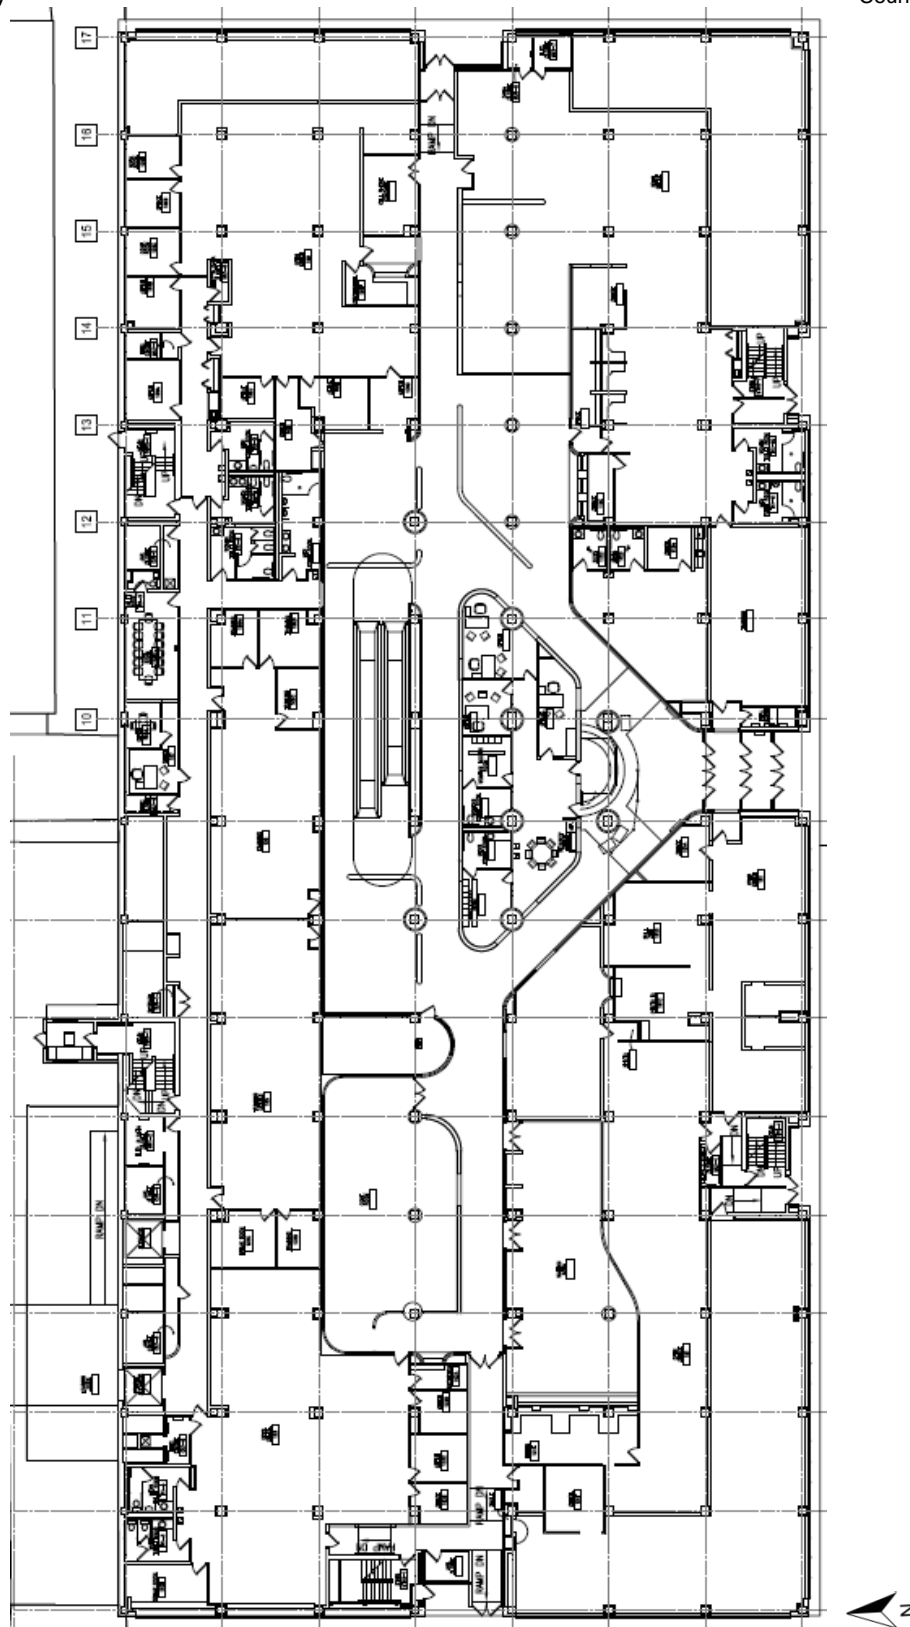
Current First Floor Plan (Quorum Architects). Not to scale.
